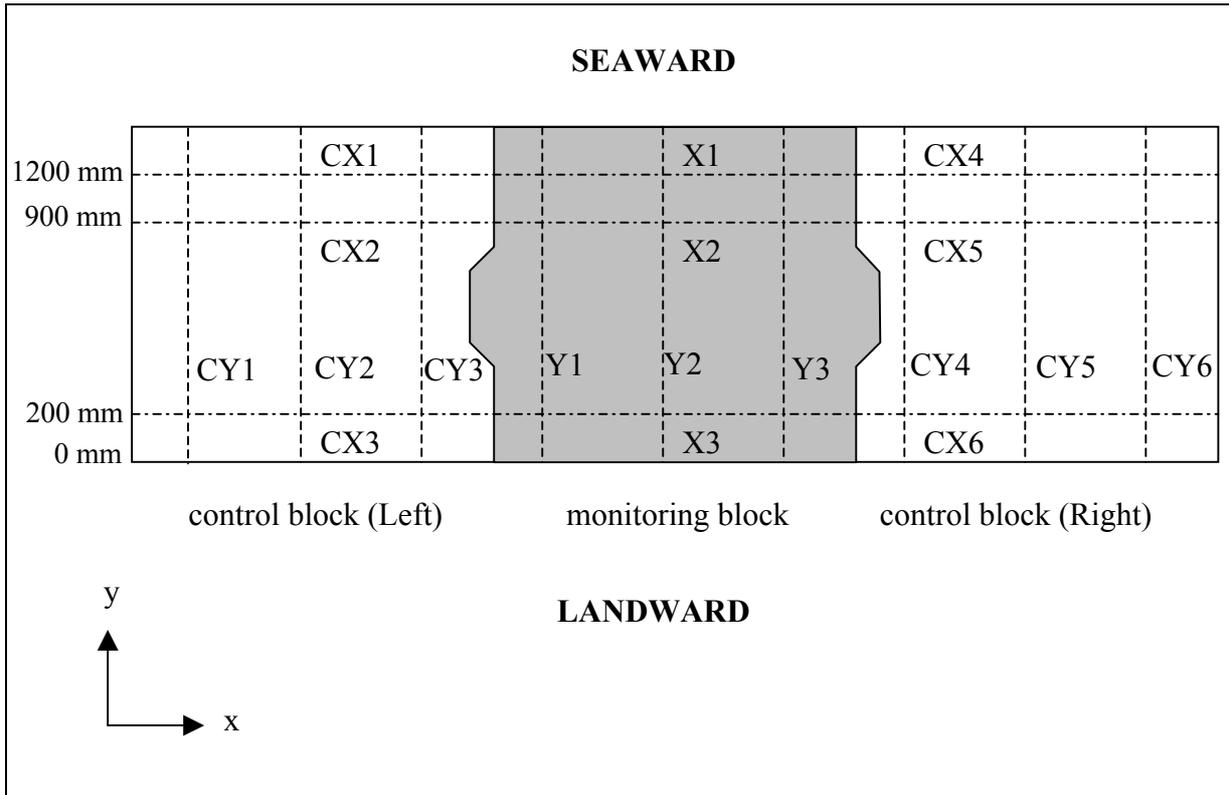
Plan View of Seawall Blocks Illustrating Method of Dimension Measurement
